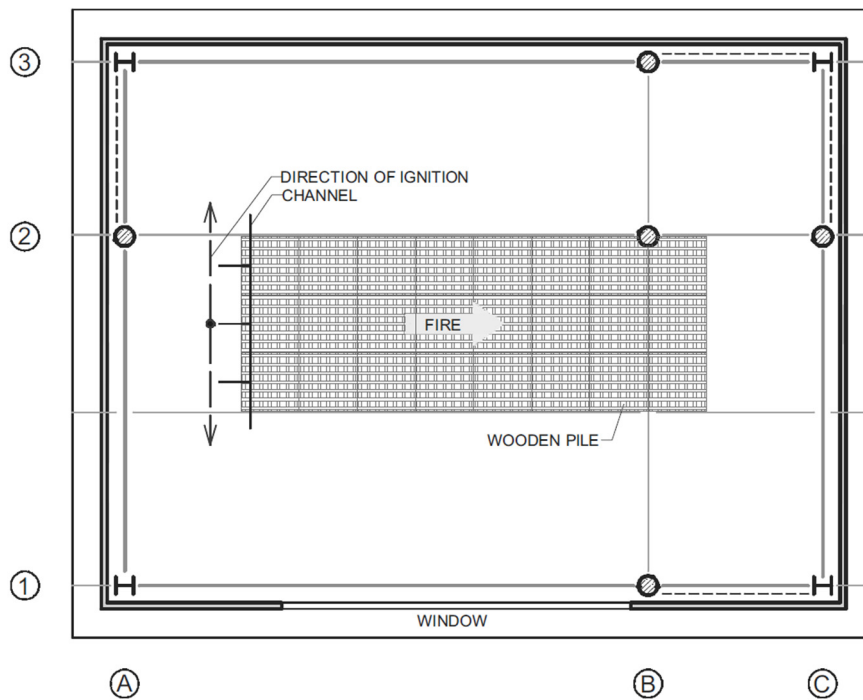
Fuel load scheme, in hatched, on the upper floor of the Veselí travelling fire experimental building, Wald *et al.* [27].
